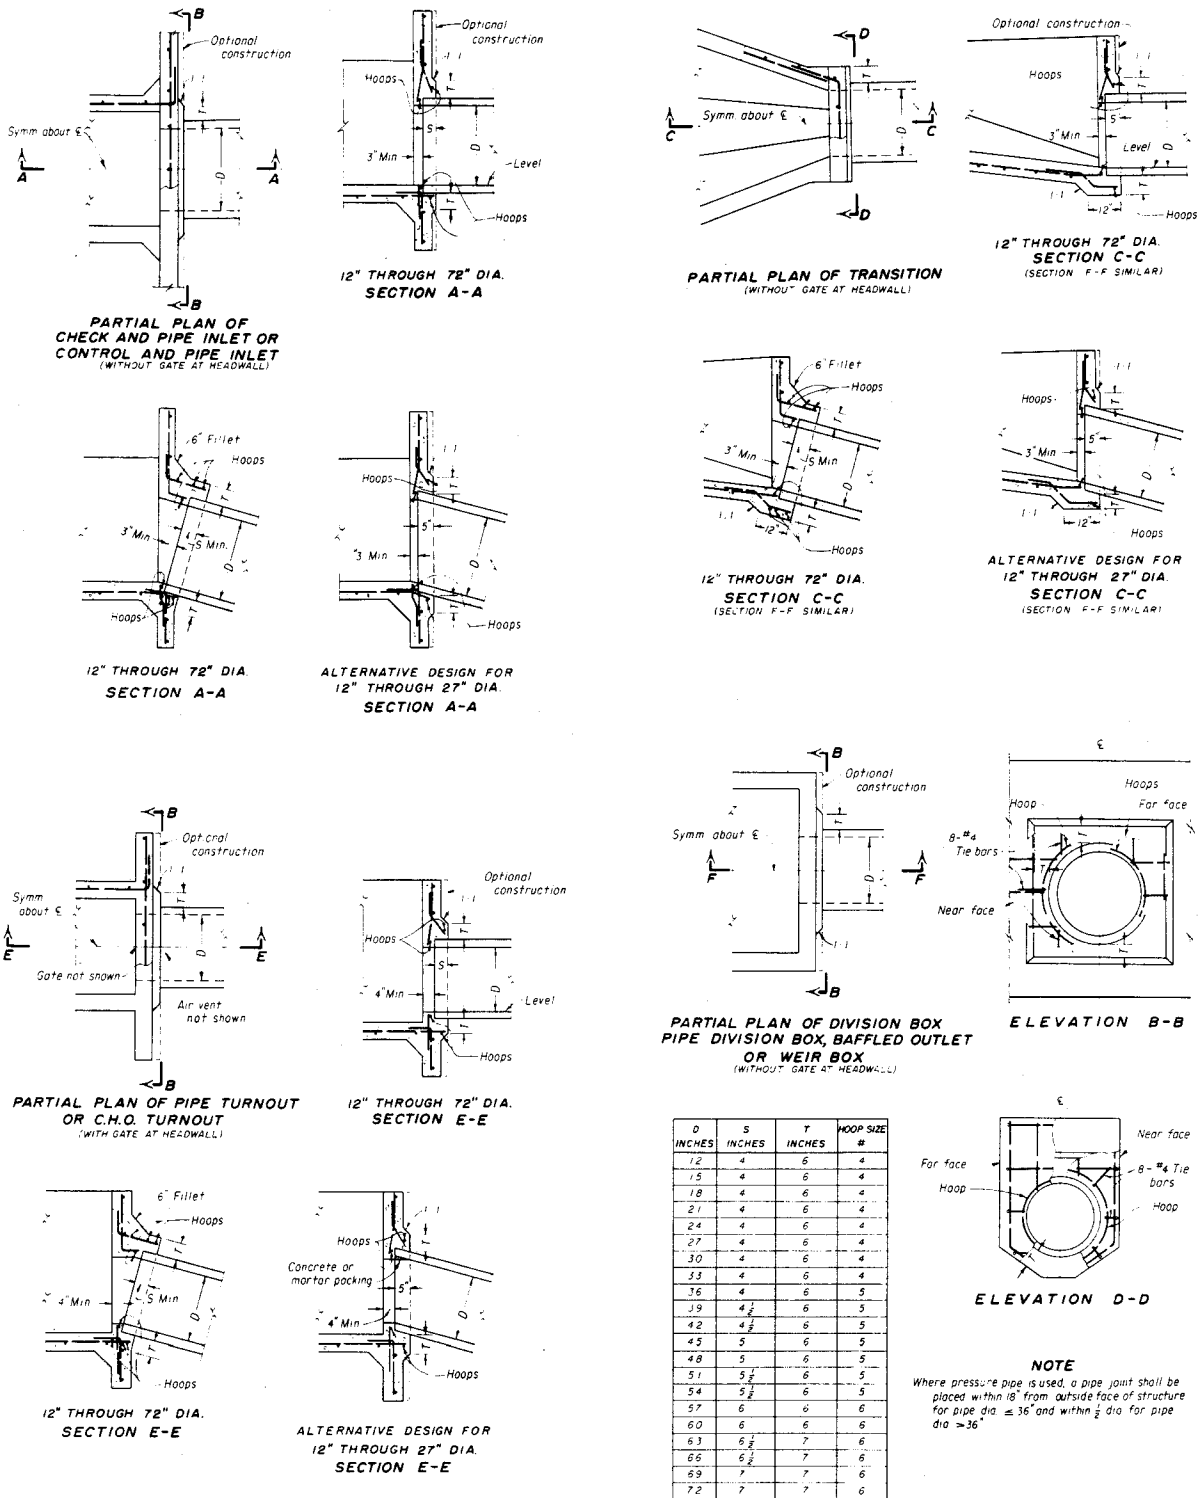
Precast concrete pipe embedment (asbestos-cement pressure and reinforced plastic pressure pipe similar). 103-D-1323
